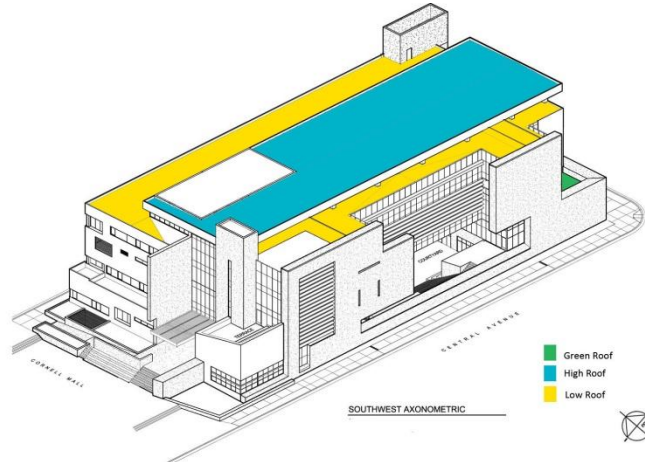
Southwest axonometric indicating roof levels. Modified by N. Trujillo (Courtesy of Jon Anderson Architect)
